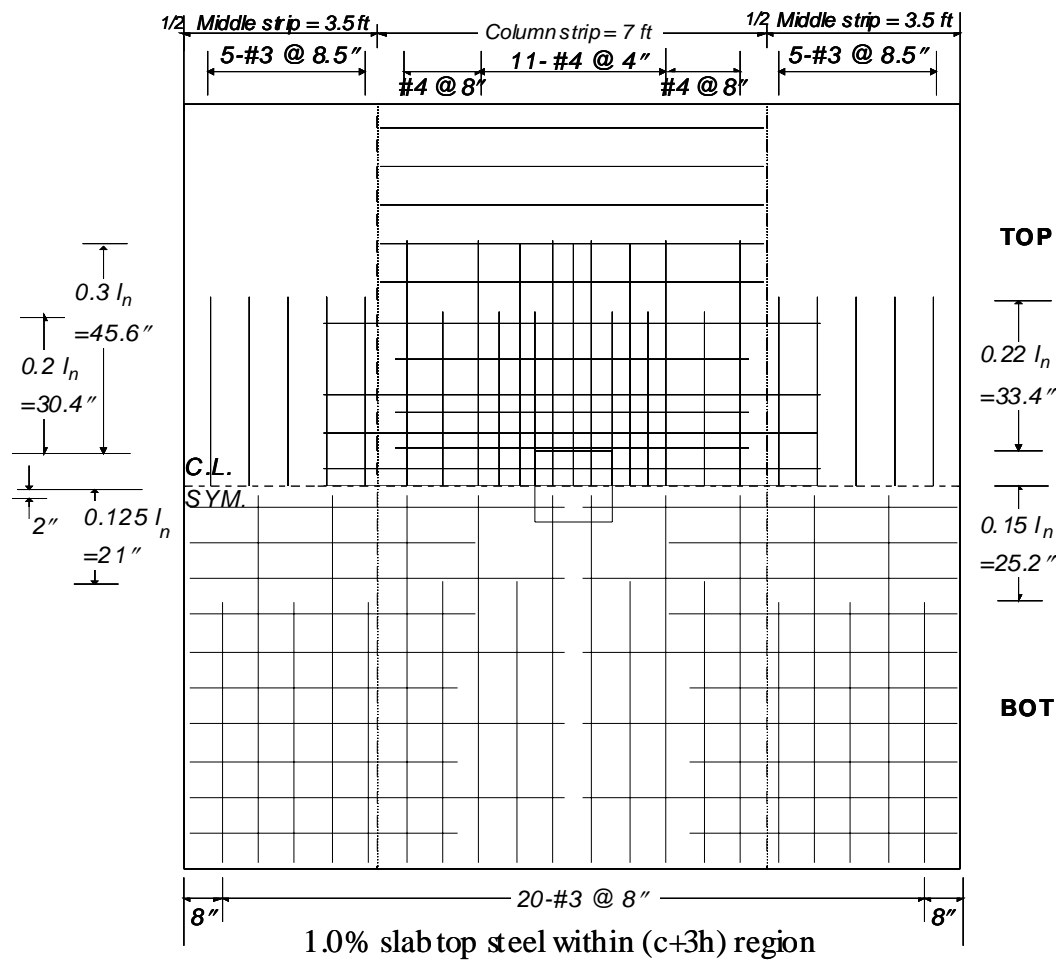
Reinforcement layout for specimens G1.0 and LG1.0
